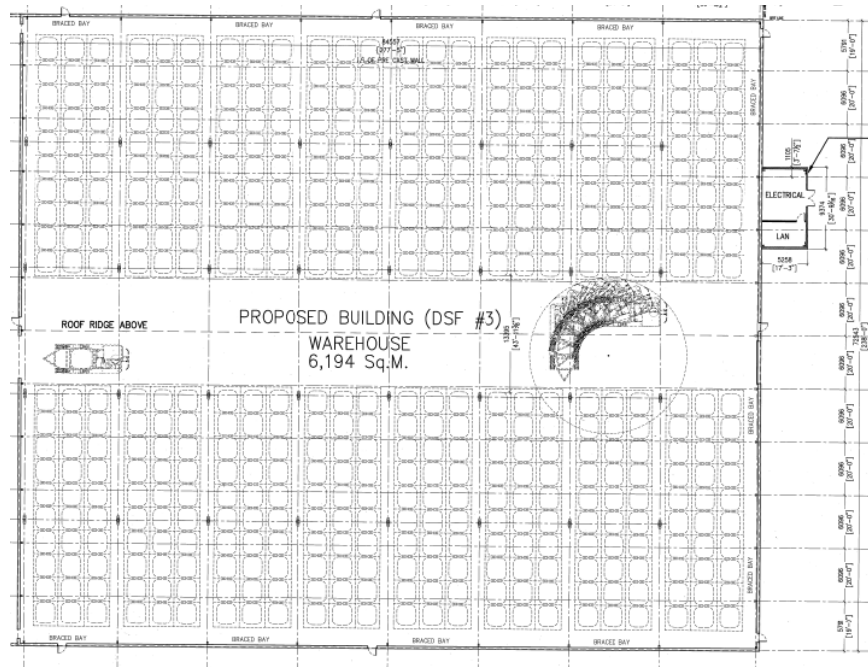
Layout of DSC Storage Building 3 (Phase II)
